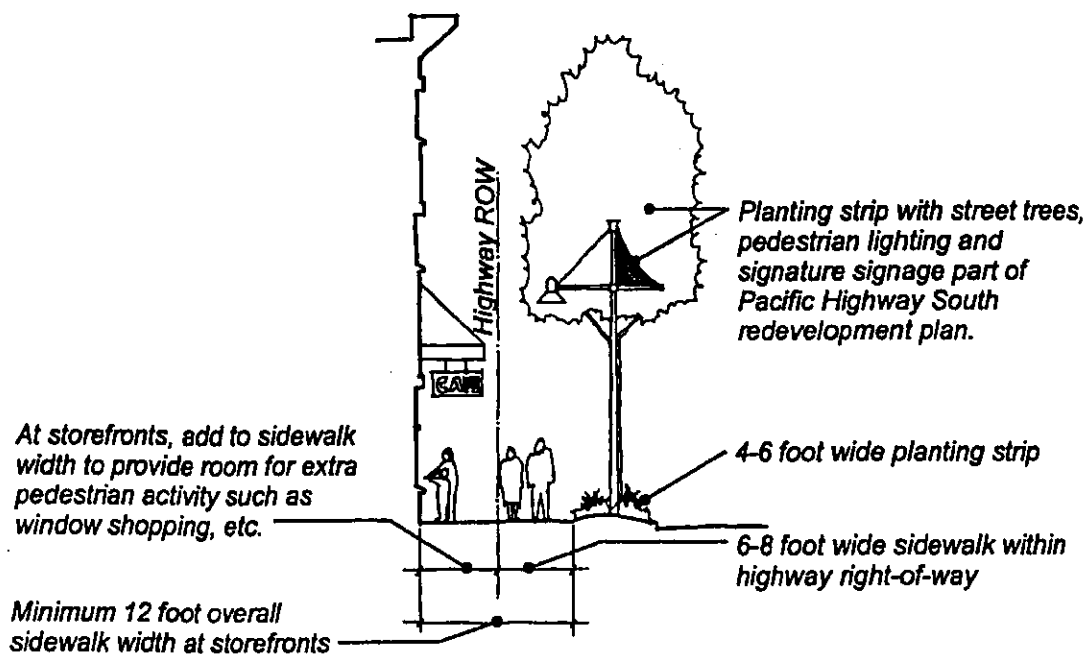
B.1.a: Section through sidewalk on Pacific Highway South
